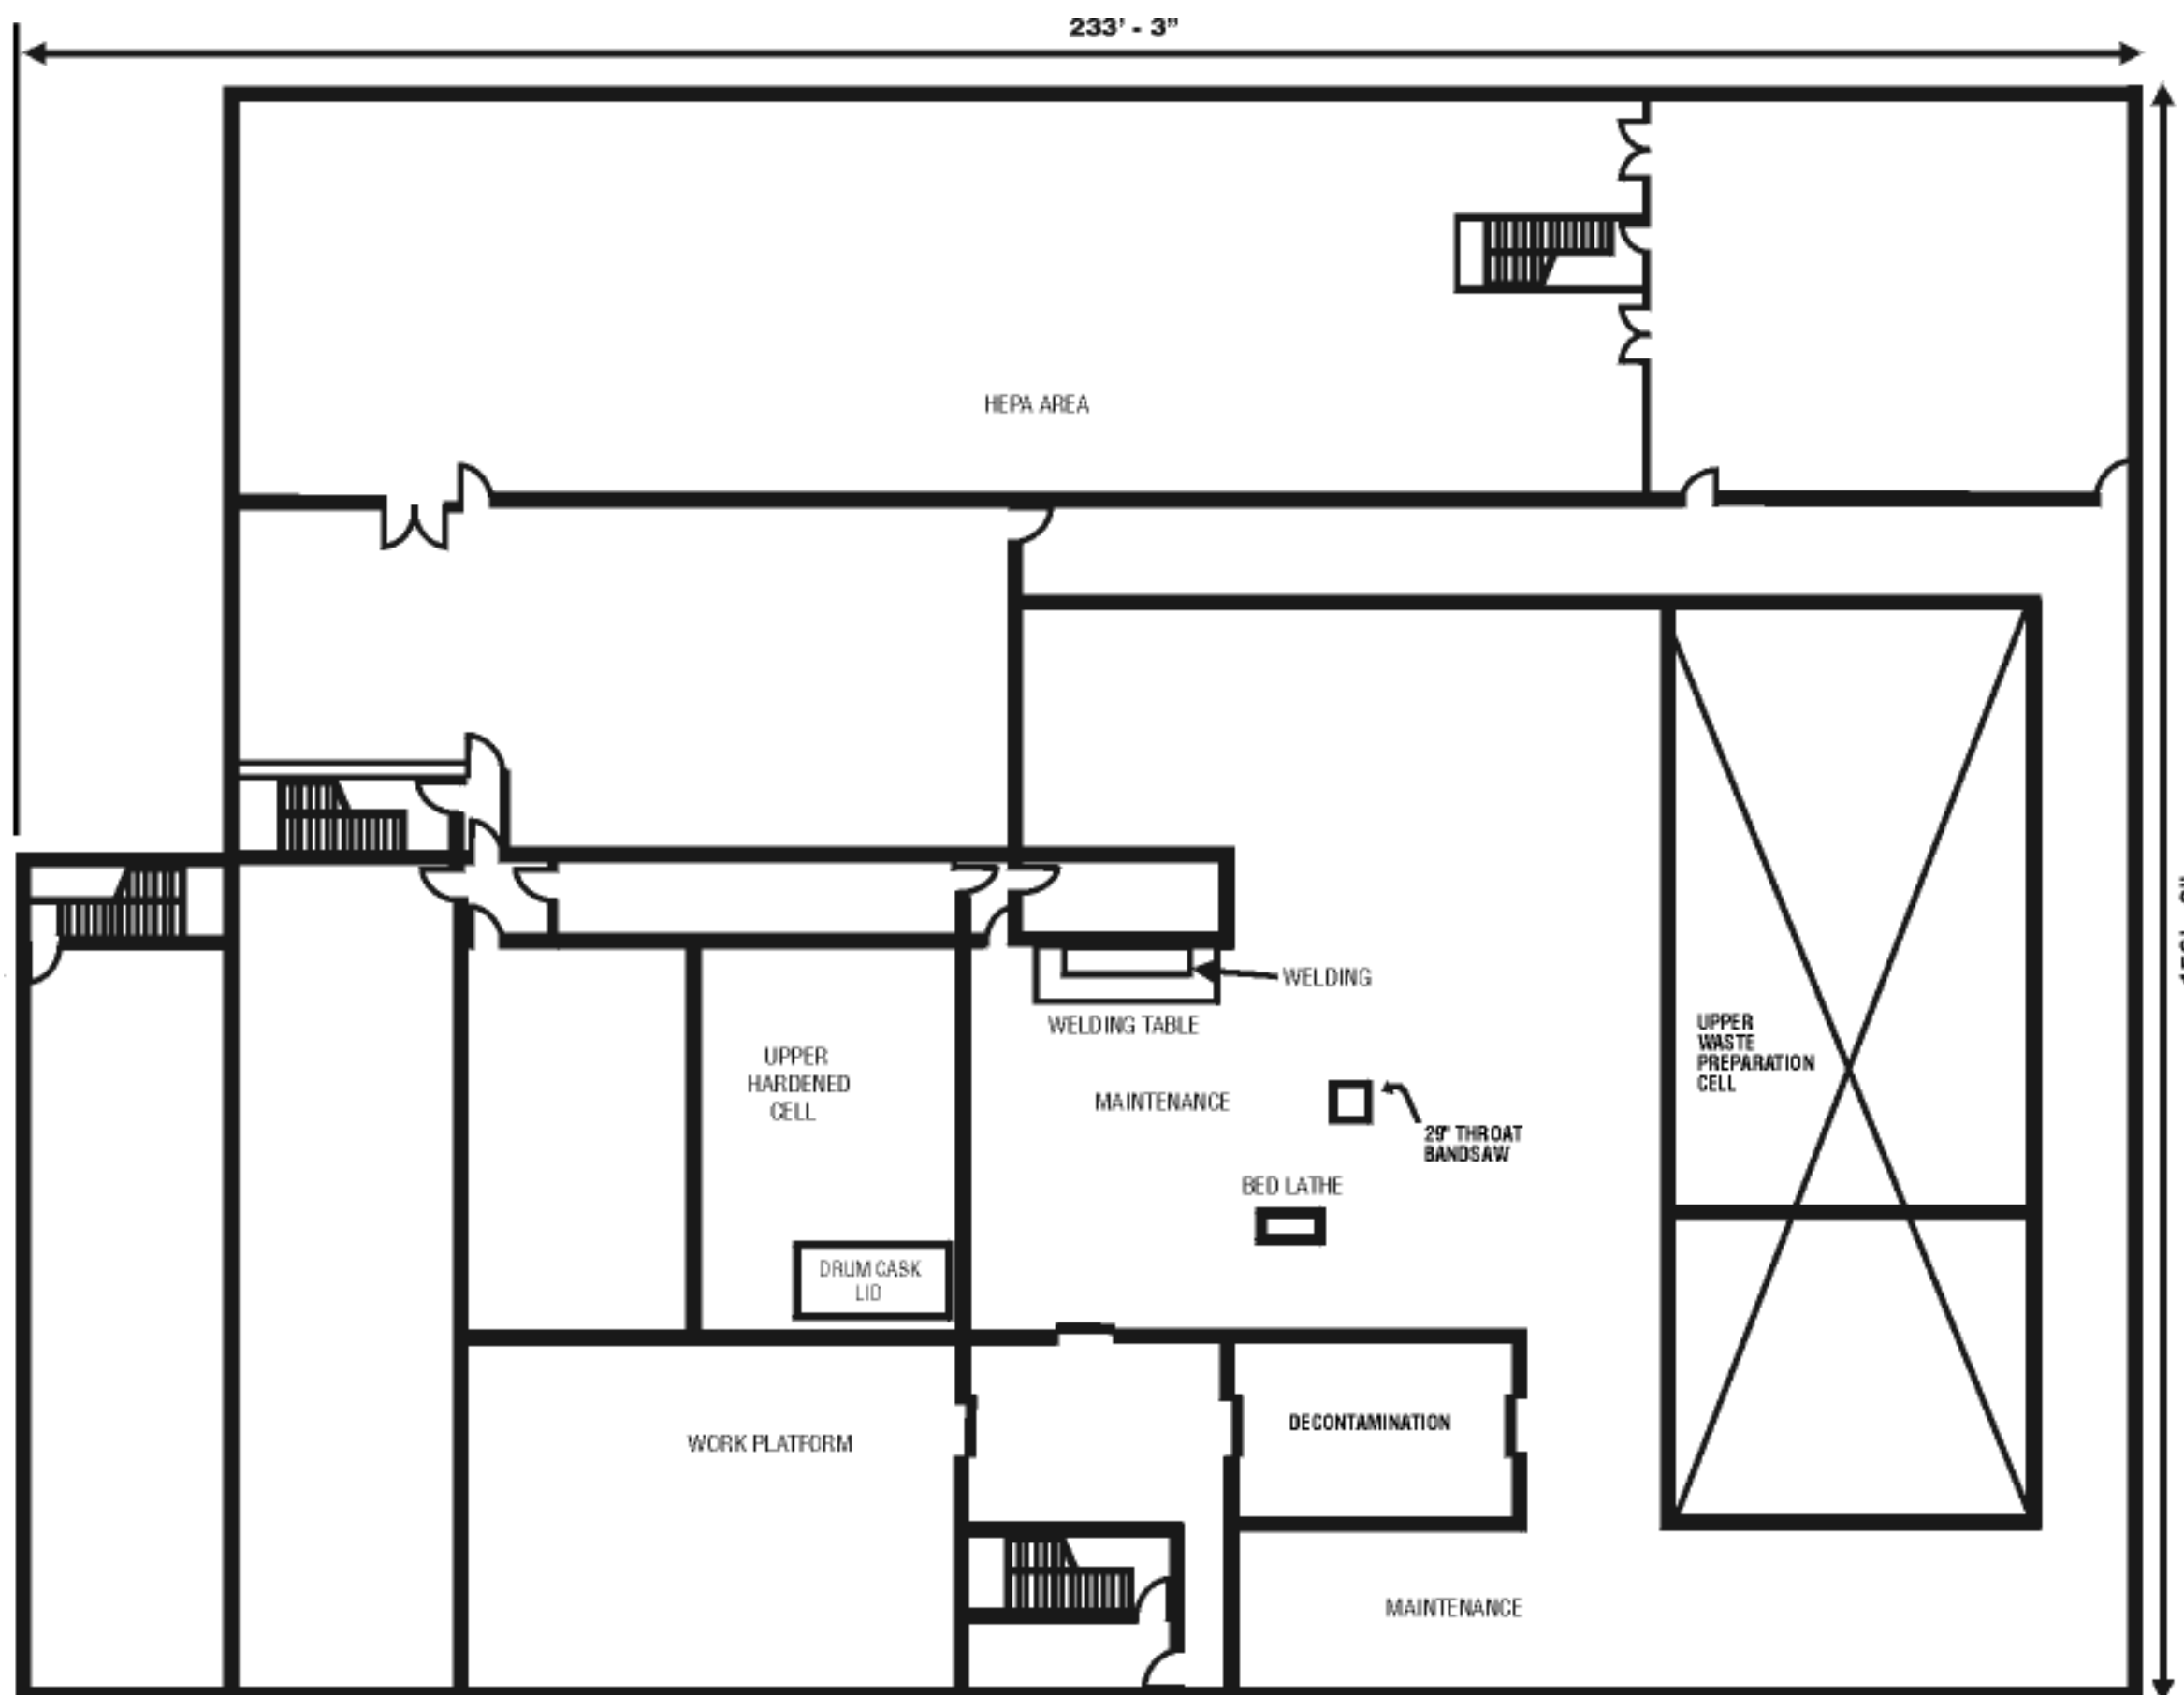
A Schematic of the Equipment Arrangement Process, Second Floor Plan at the SRS, TRU Waste Facility (Adapted from Drawing Number SE5-2008821, Rev. D)
